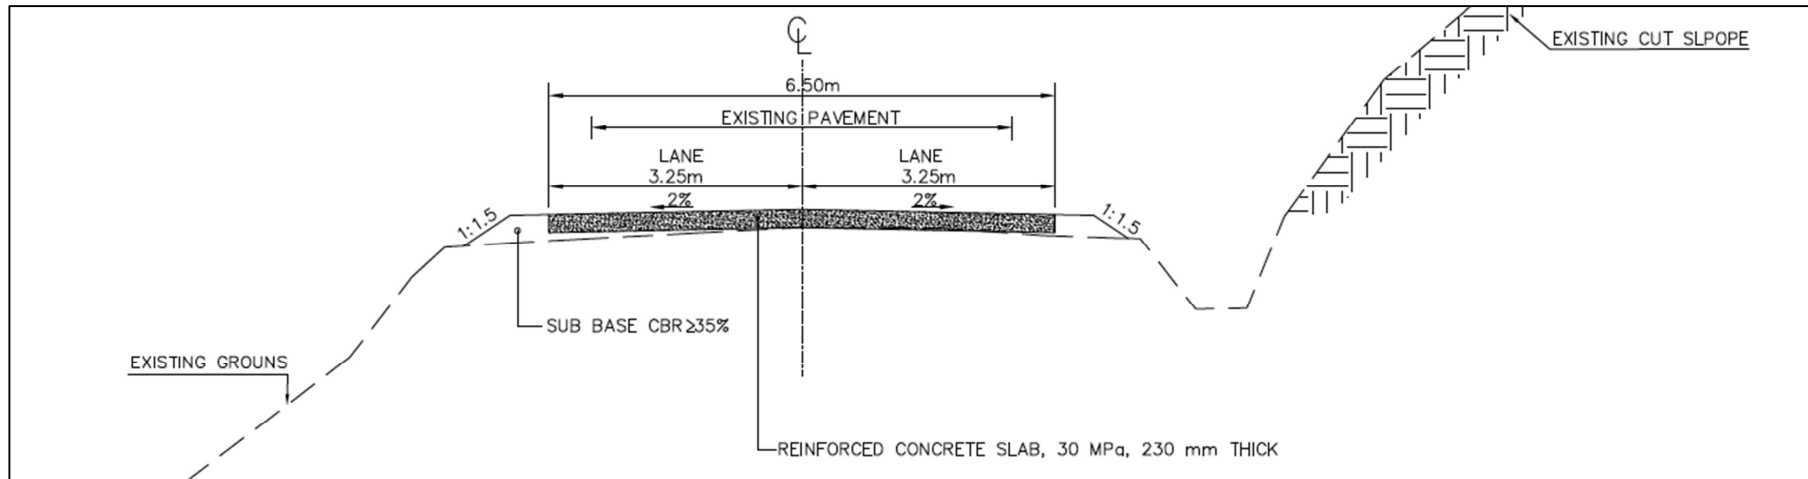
Cross Section Raised Profile (in flat and rolling) (TC3)
